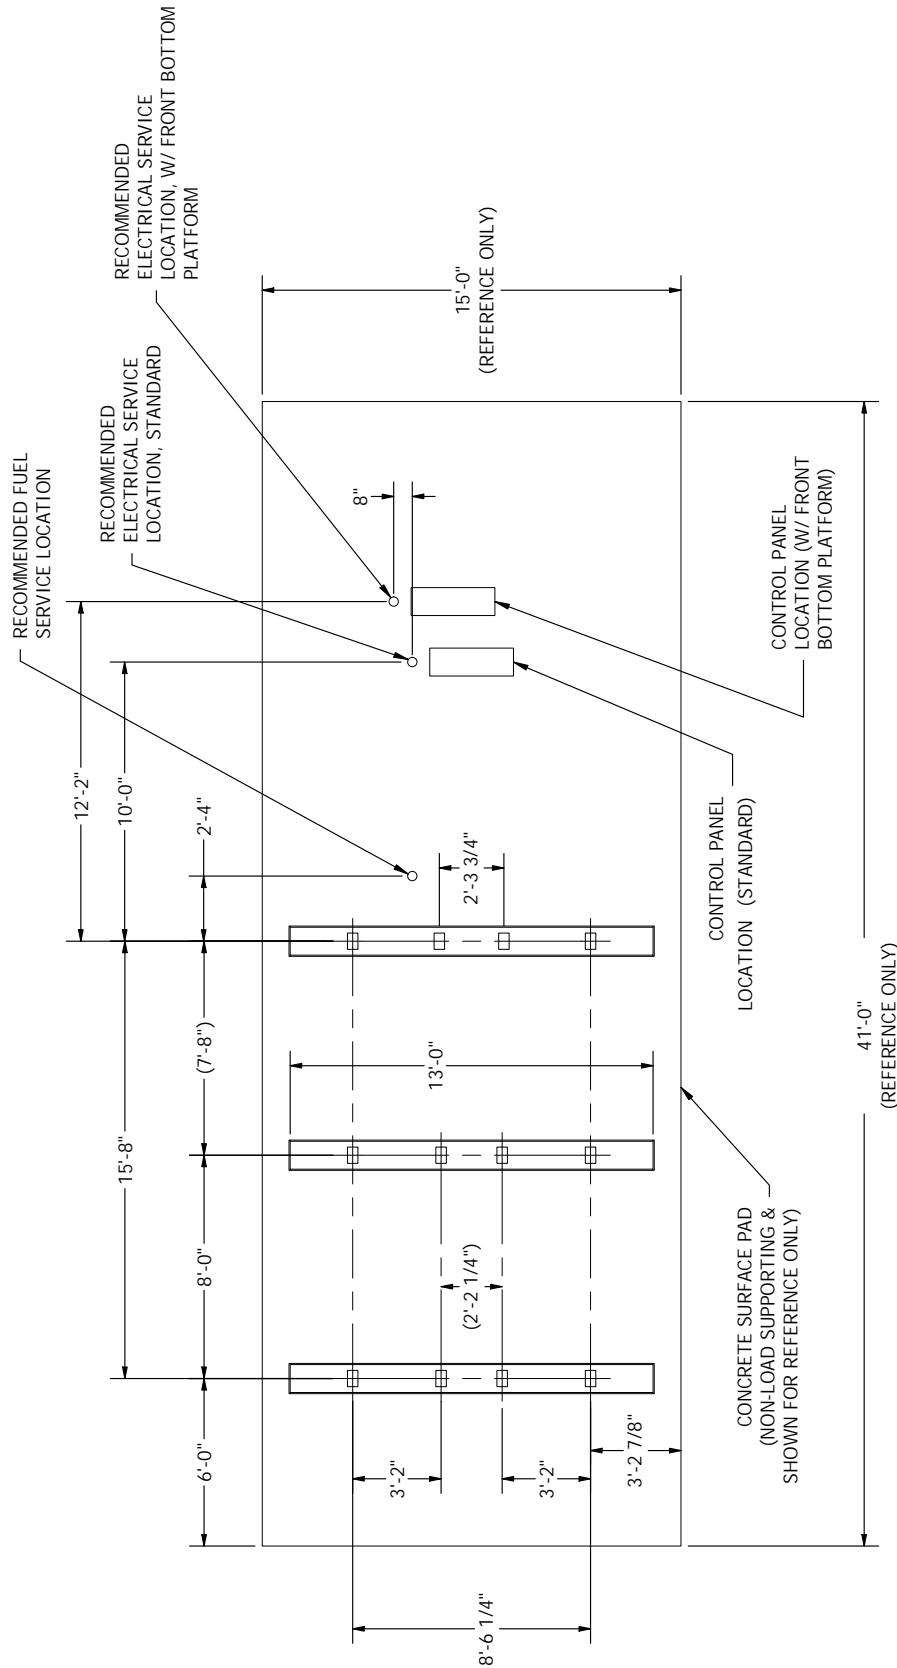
Load Point (Anchor Legs) Layout for Dryer Models D1670, D1680, and D1690
